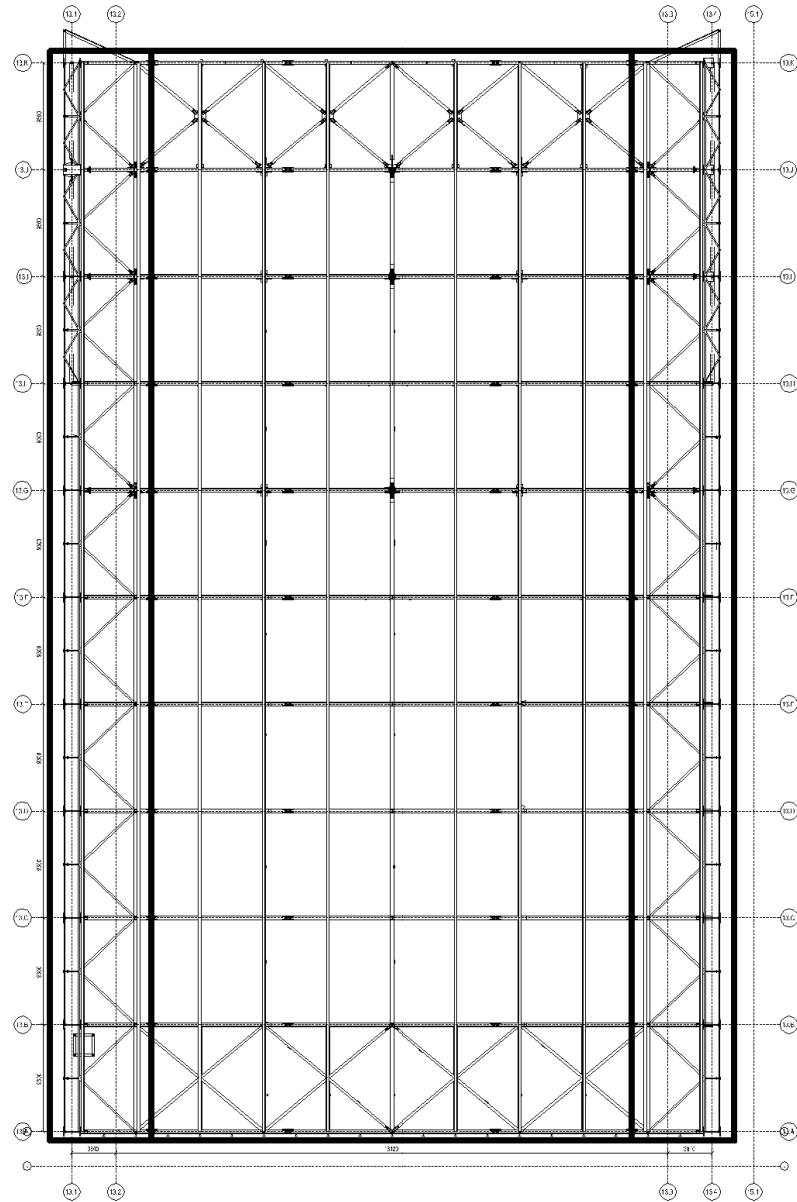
Roof plan at bottom chord level (by Subcontractor)
